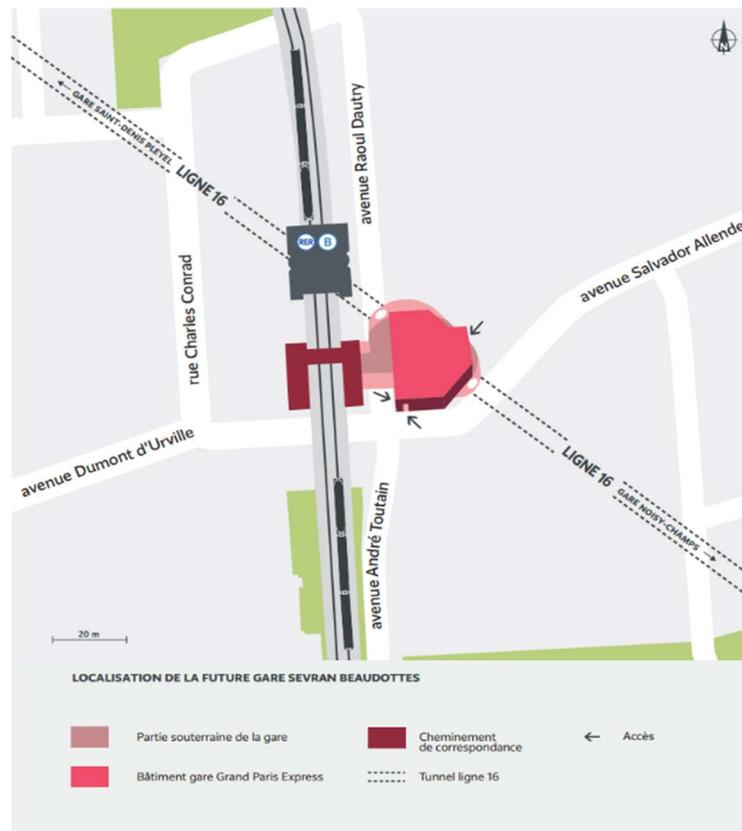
Plan view of Station showing intersection with Line 16 underground network
